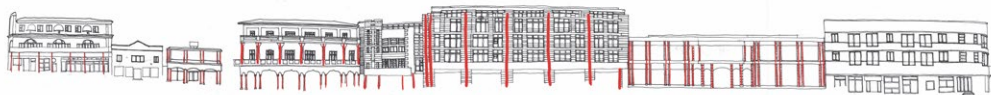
Elevational drawing of the column-dominated facades along Beach Road which create their own rhythm and connection to the ground.
